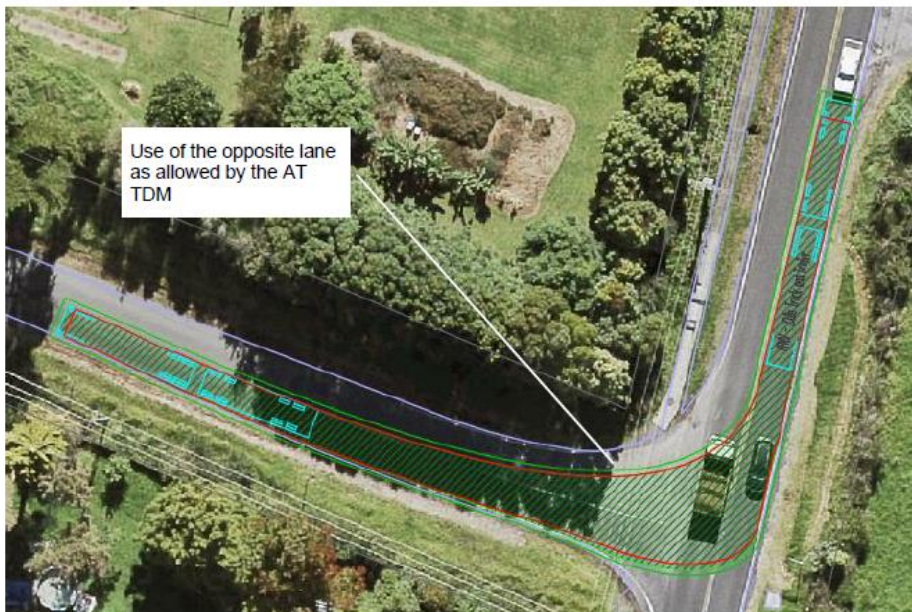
Trig Road / Spedding Road – construction vehicle tracking for left out movement (from applicant’s Traffic Impact Assessment)
